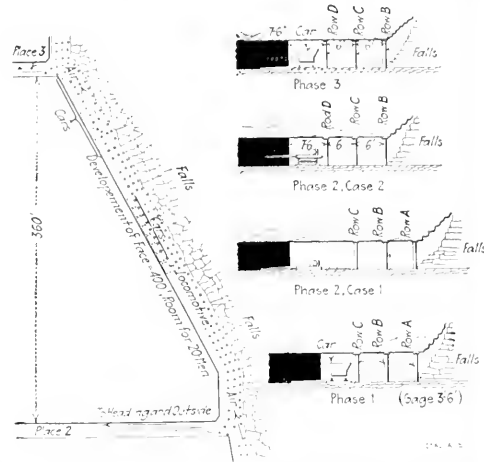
DETAIL PLAN OF SUBDIVISION 2, PANEL A, AND CROSS-SECTIONS AT THE FACE
